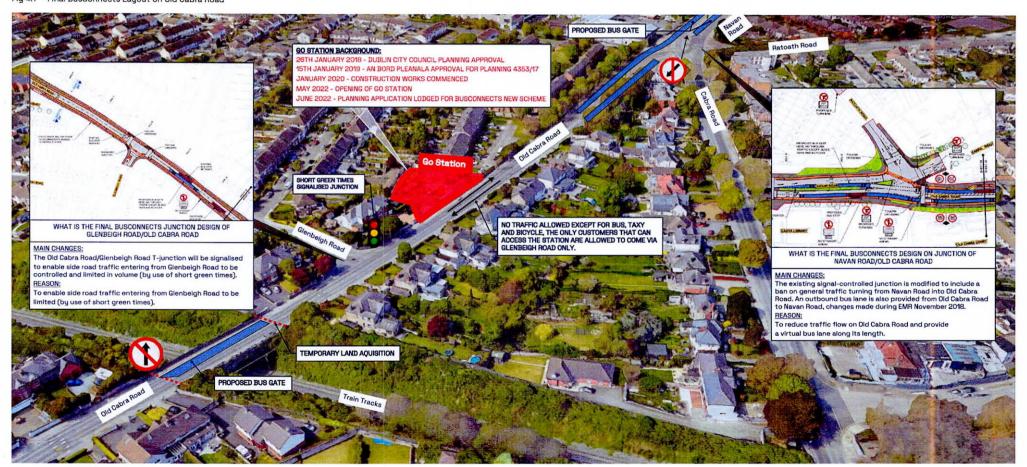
Final BusConnects Layout on Old Cabra Road
